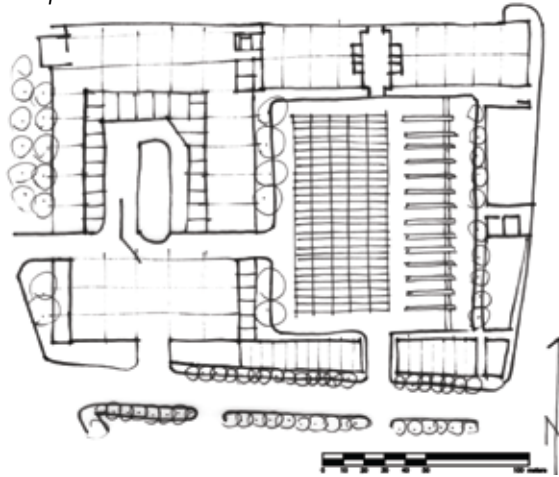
BARAGWANATH TRANSPORT FACILITY PLAN
